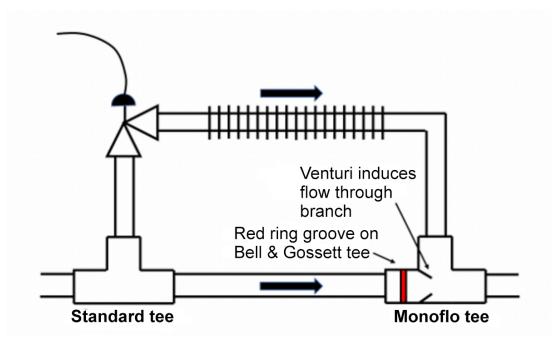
Upfed heat transfer unit. (Greg Wirachowsky/ Skilled Trades BC, 2021) Used with permission.
